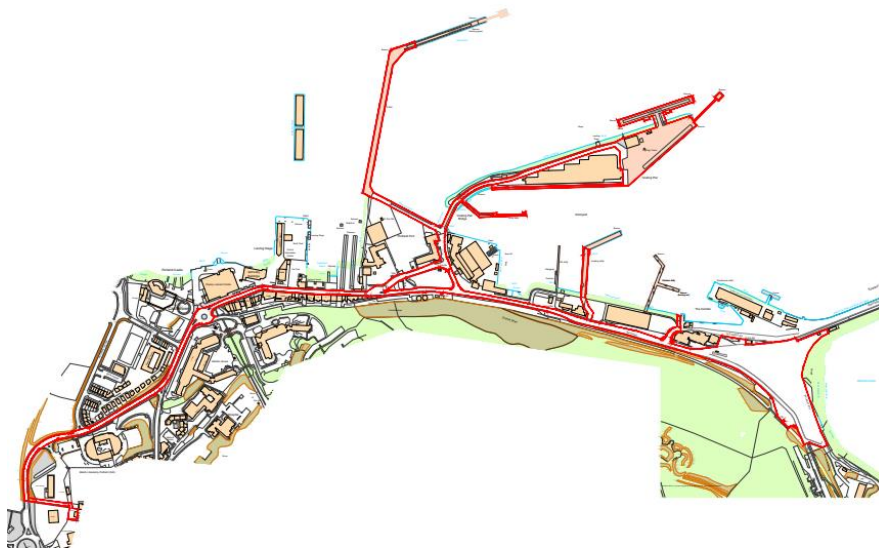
The proposed foot path not shown within the red line plan submitted with the proposal
